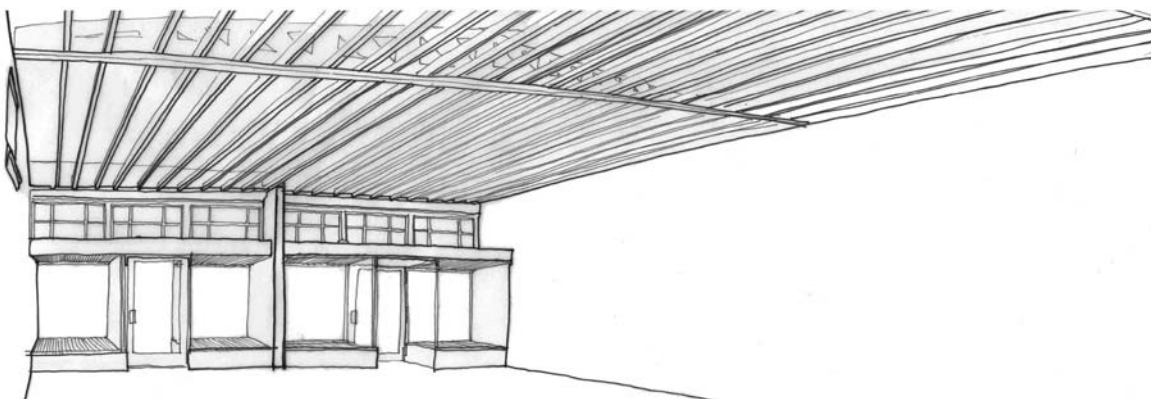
Detail of existing cypress box truss, ceiling joists, roof joists, and roof decking.
